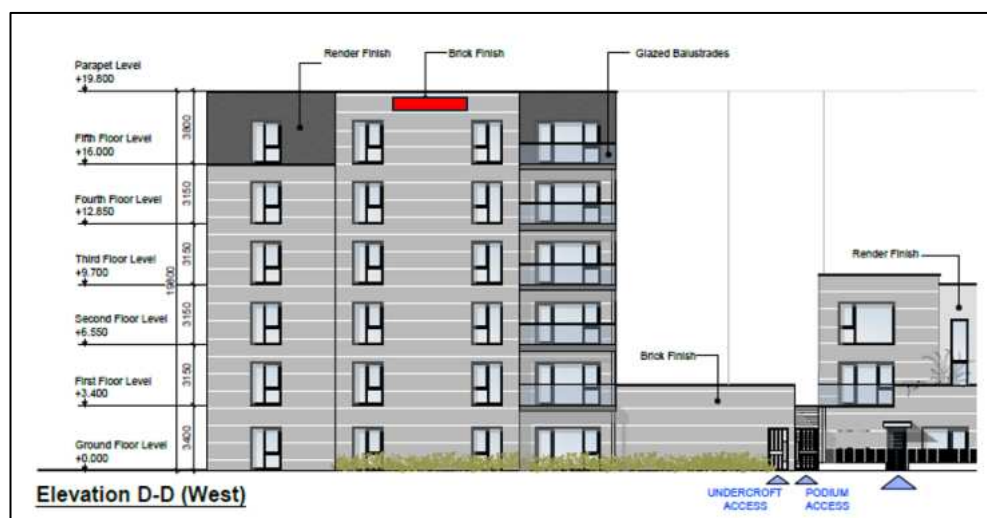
Examples of suitable locations for Swift Bricks on Block A (western elevation) shown in red (adapted from MCORM Drwg: PL207).
